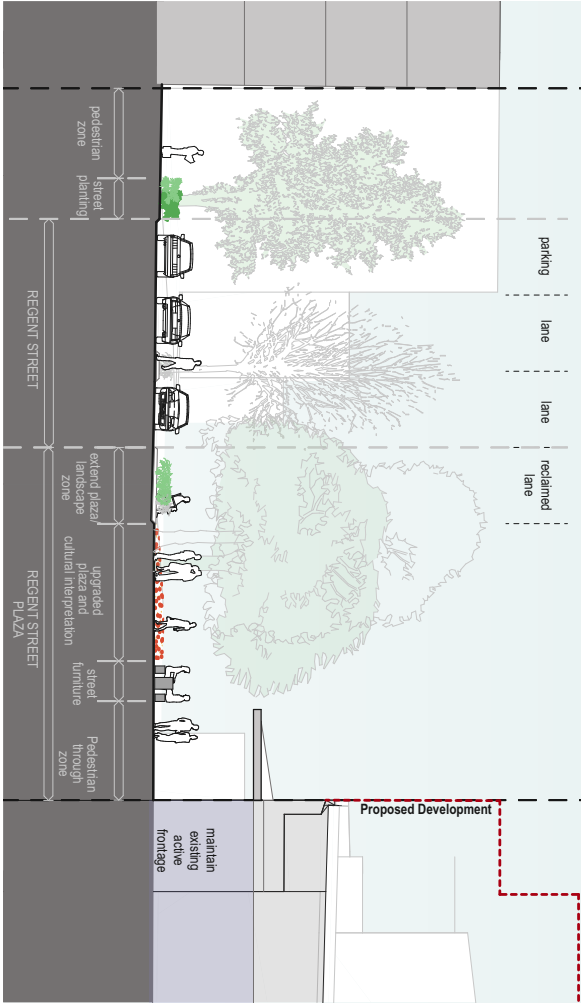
Street Typology Section D - Regent Street Plaza Upgrade
